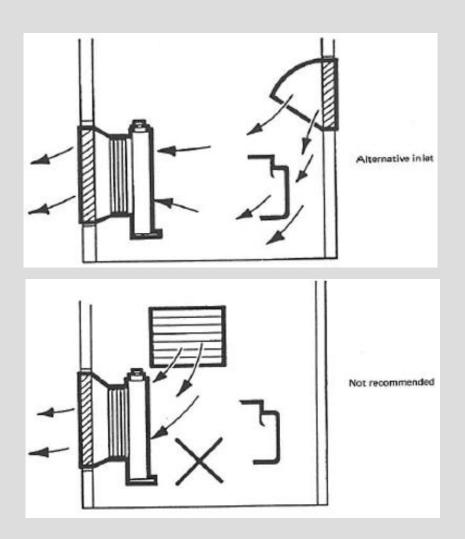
Examples of a flexible duct installation on a Generating Set. Ensure that air flows into the alternator and is not bypassed.
